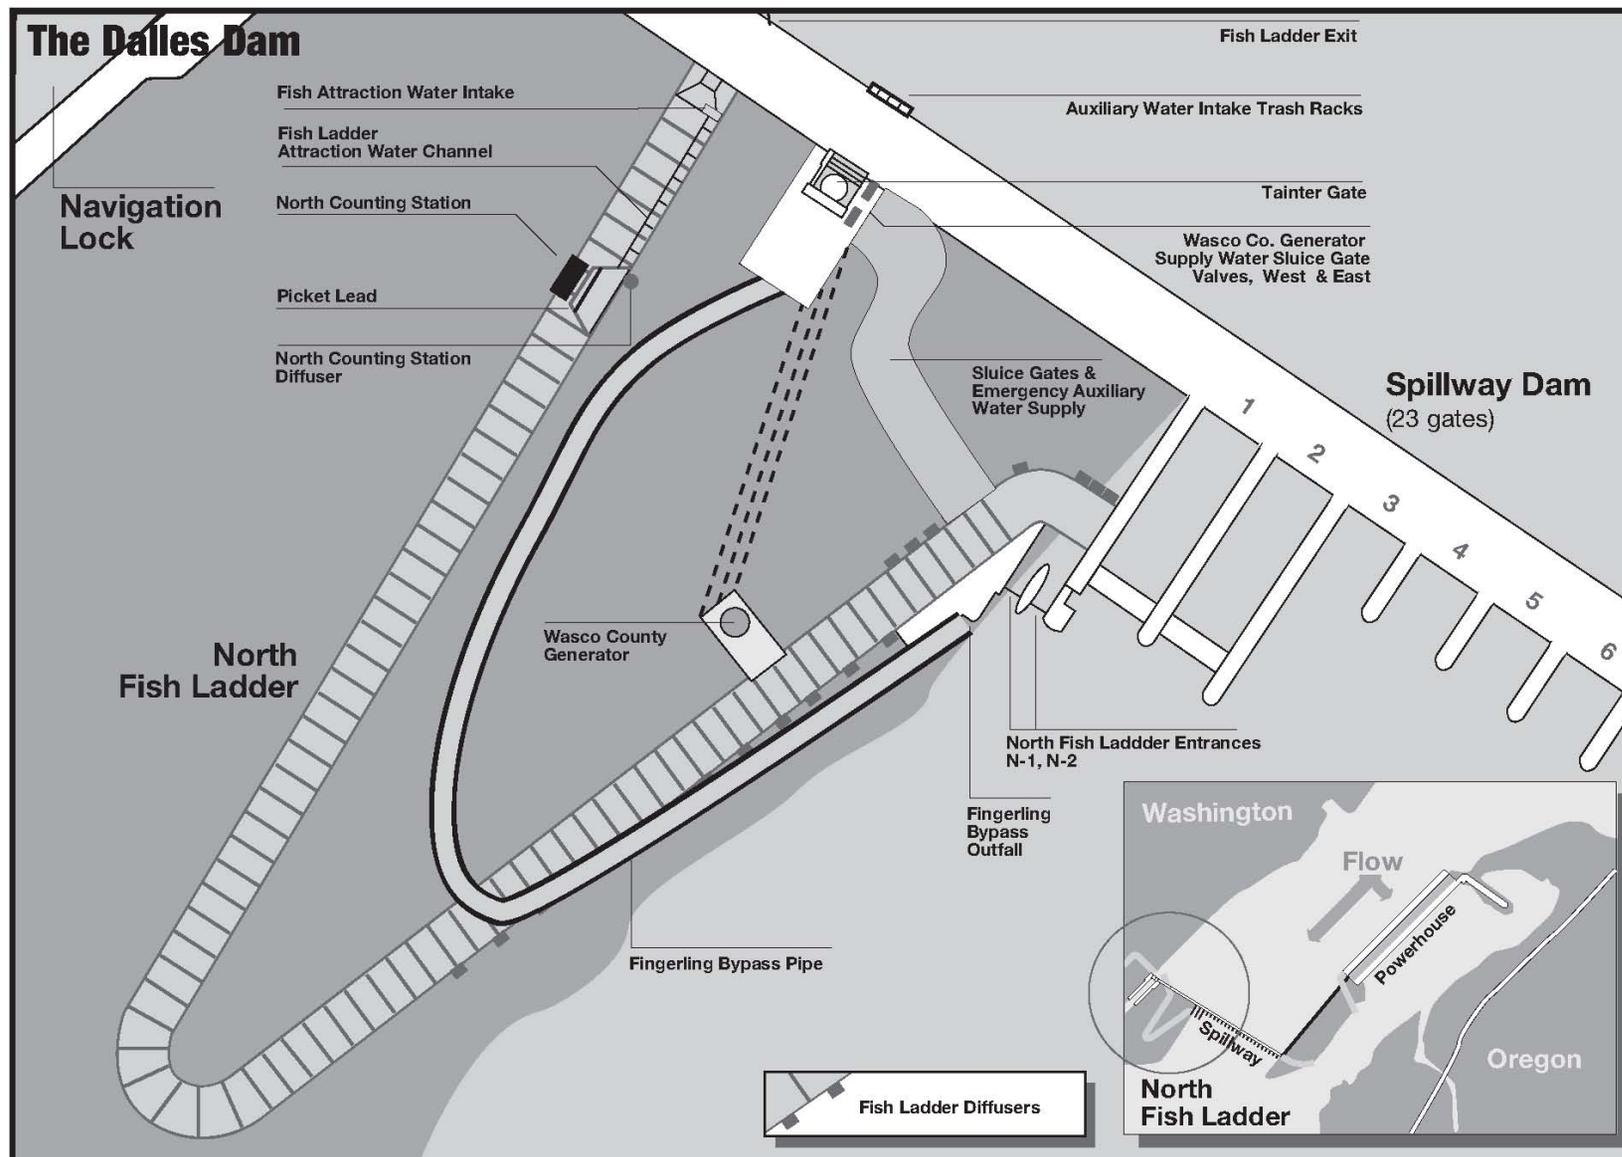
The Dalles Dam North Fish Ladder and Spillway (courtesy of USACE).
